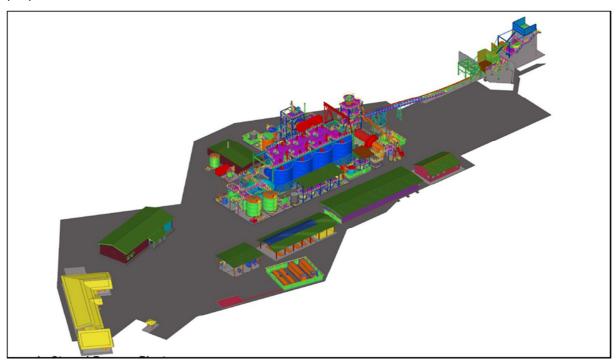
Typical arrangement of 400ktpa Au recovery plant. Single stage crushing, SAG and ball grinding, gravity separation, carbon in leach, AARL carbon striping, tails thickening and cyanide detoxification.
